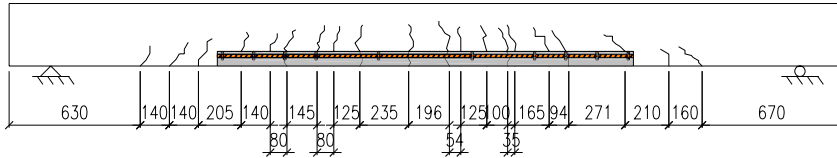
Longitudinal view of repaired beam with crack pattern after failure load test.
